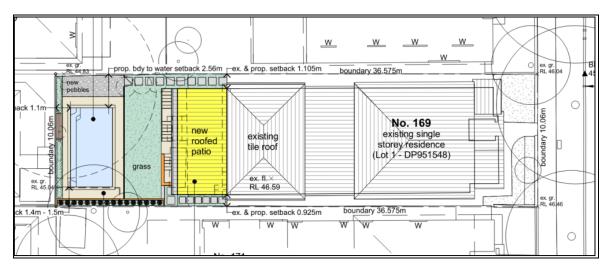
Proposed site plan – 169 Rainbow Street, Randwick
